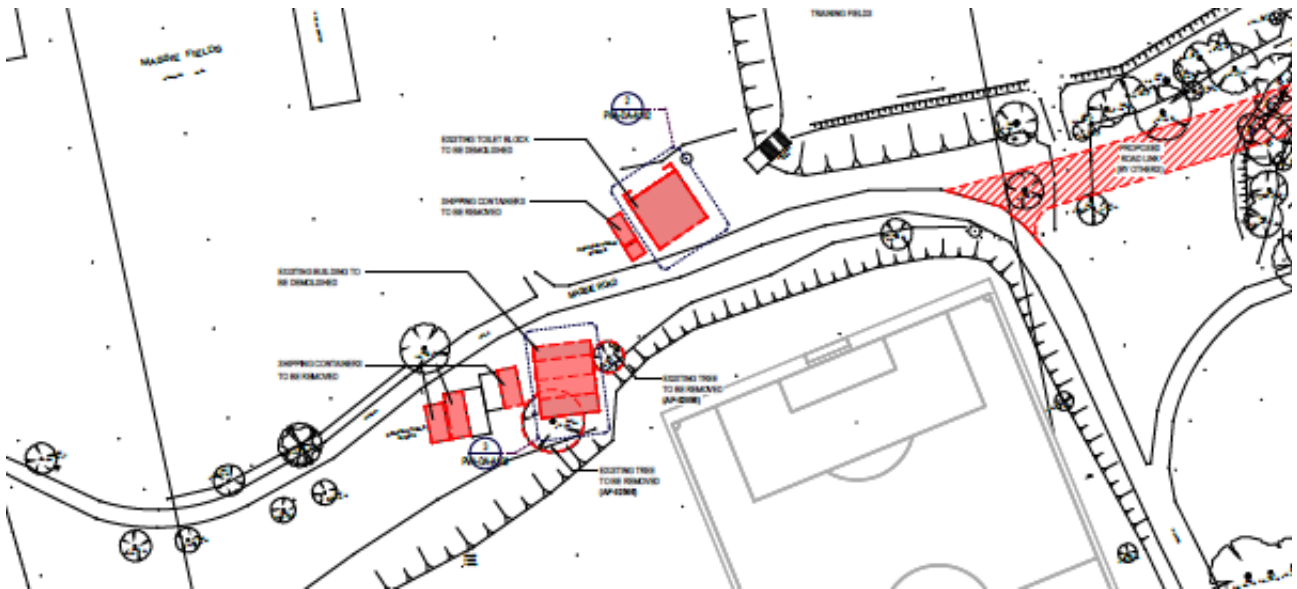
Detailed demolition plan showing the structures proposed for demolition and the extent of road works.
